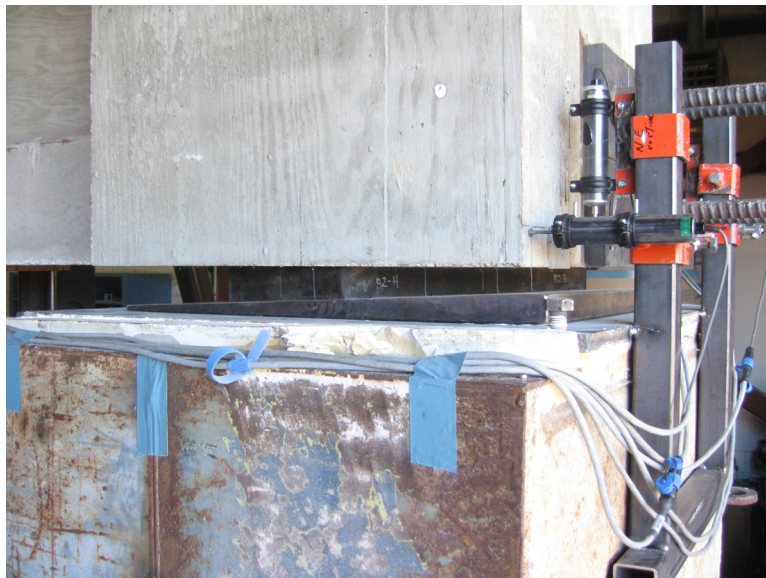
Beveled plate and bearing pad positioned between end block and end support
